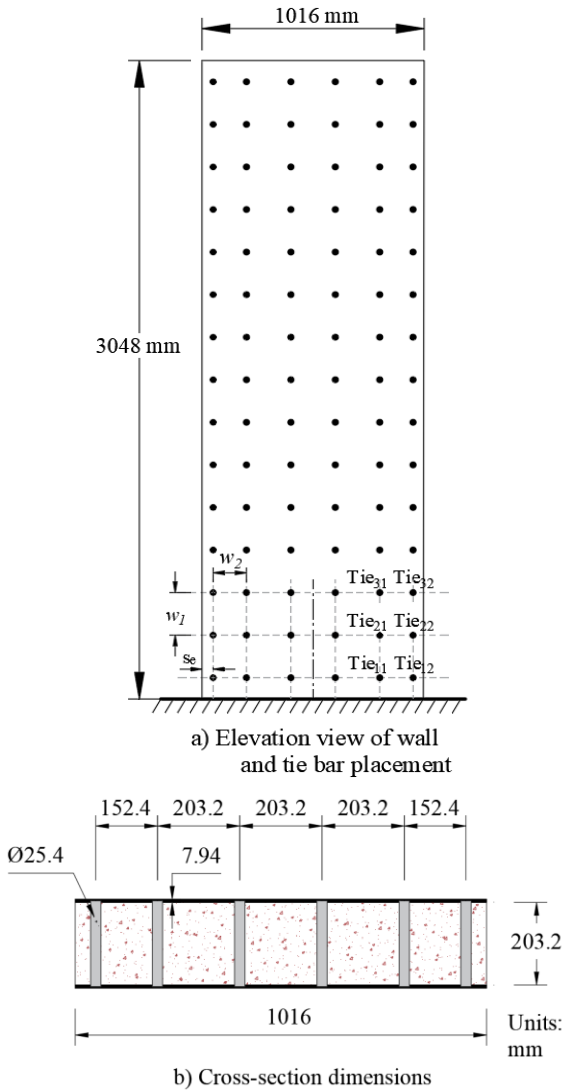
Dimensions of Model NB in: (a) Elevation view of wall and tie bar placement; and (b) Cross-section.
